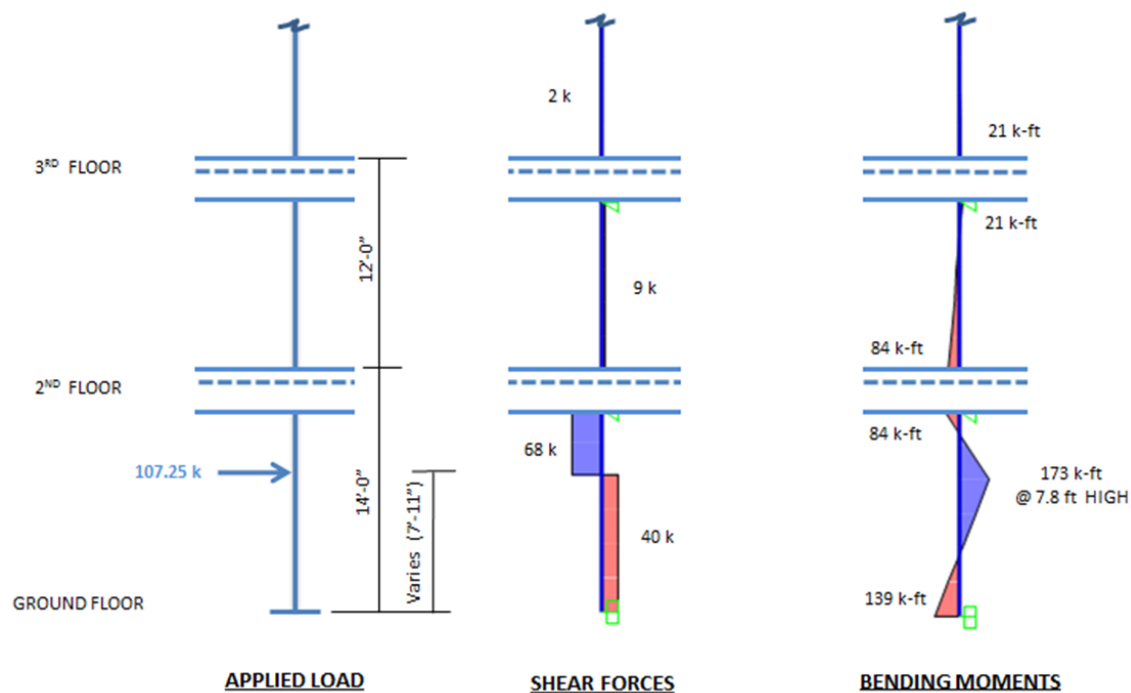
Impact load applied at " $d + h_c$ " away from the end of column on the ground floor
